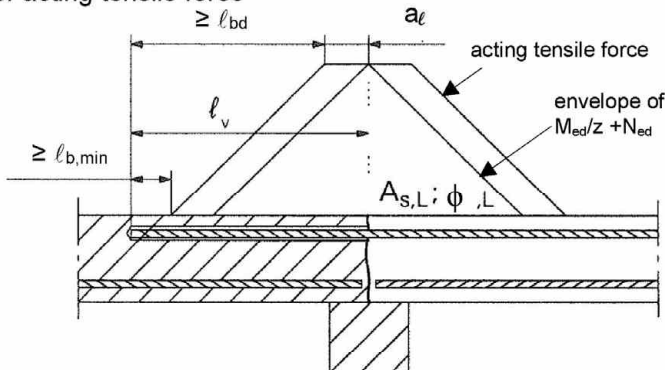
Overlapping joint at a foundation of a wall or column where the rebars are stressed in tension
